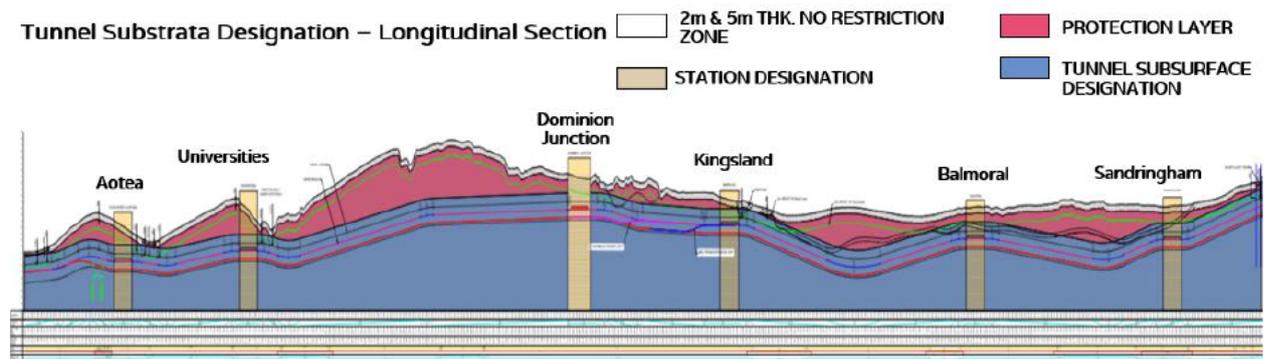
Typical Substrata NoR Boundary – Longitudinal Section
